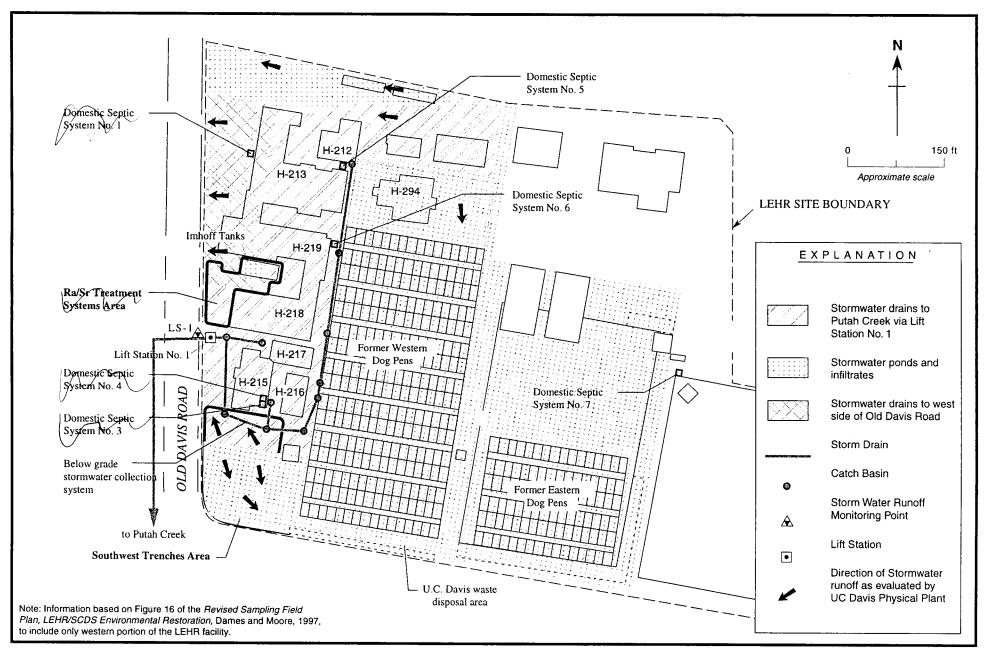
LEHR Site Stormwater Runoff Flow Patterns and Collection Systems
